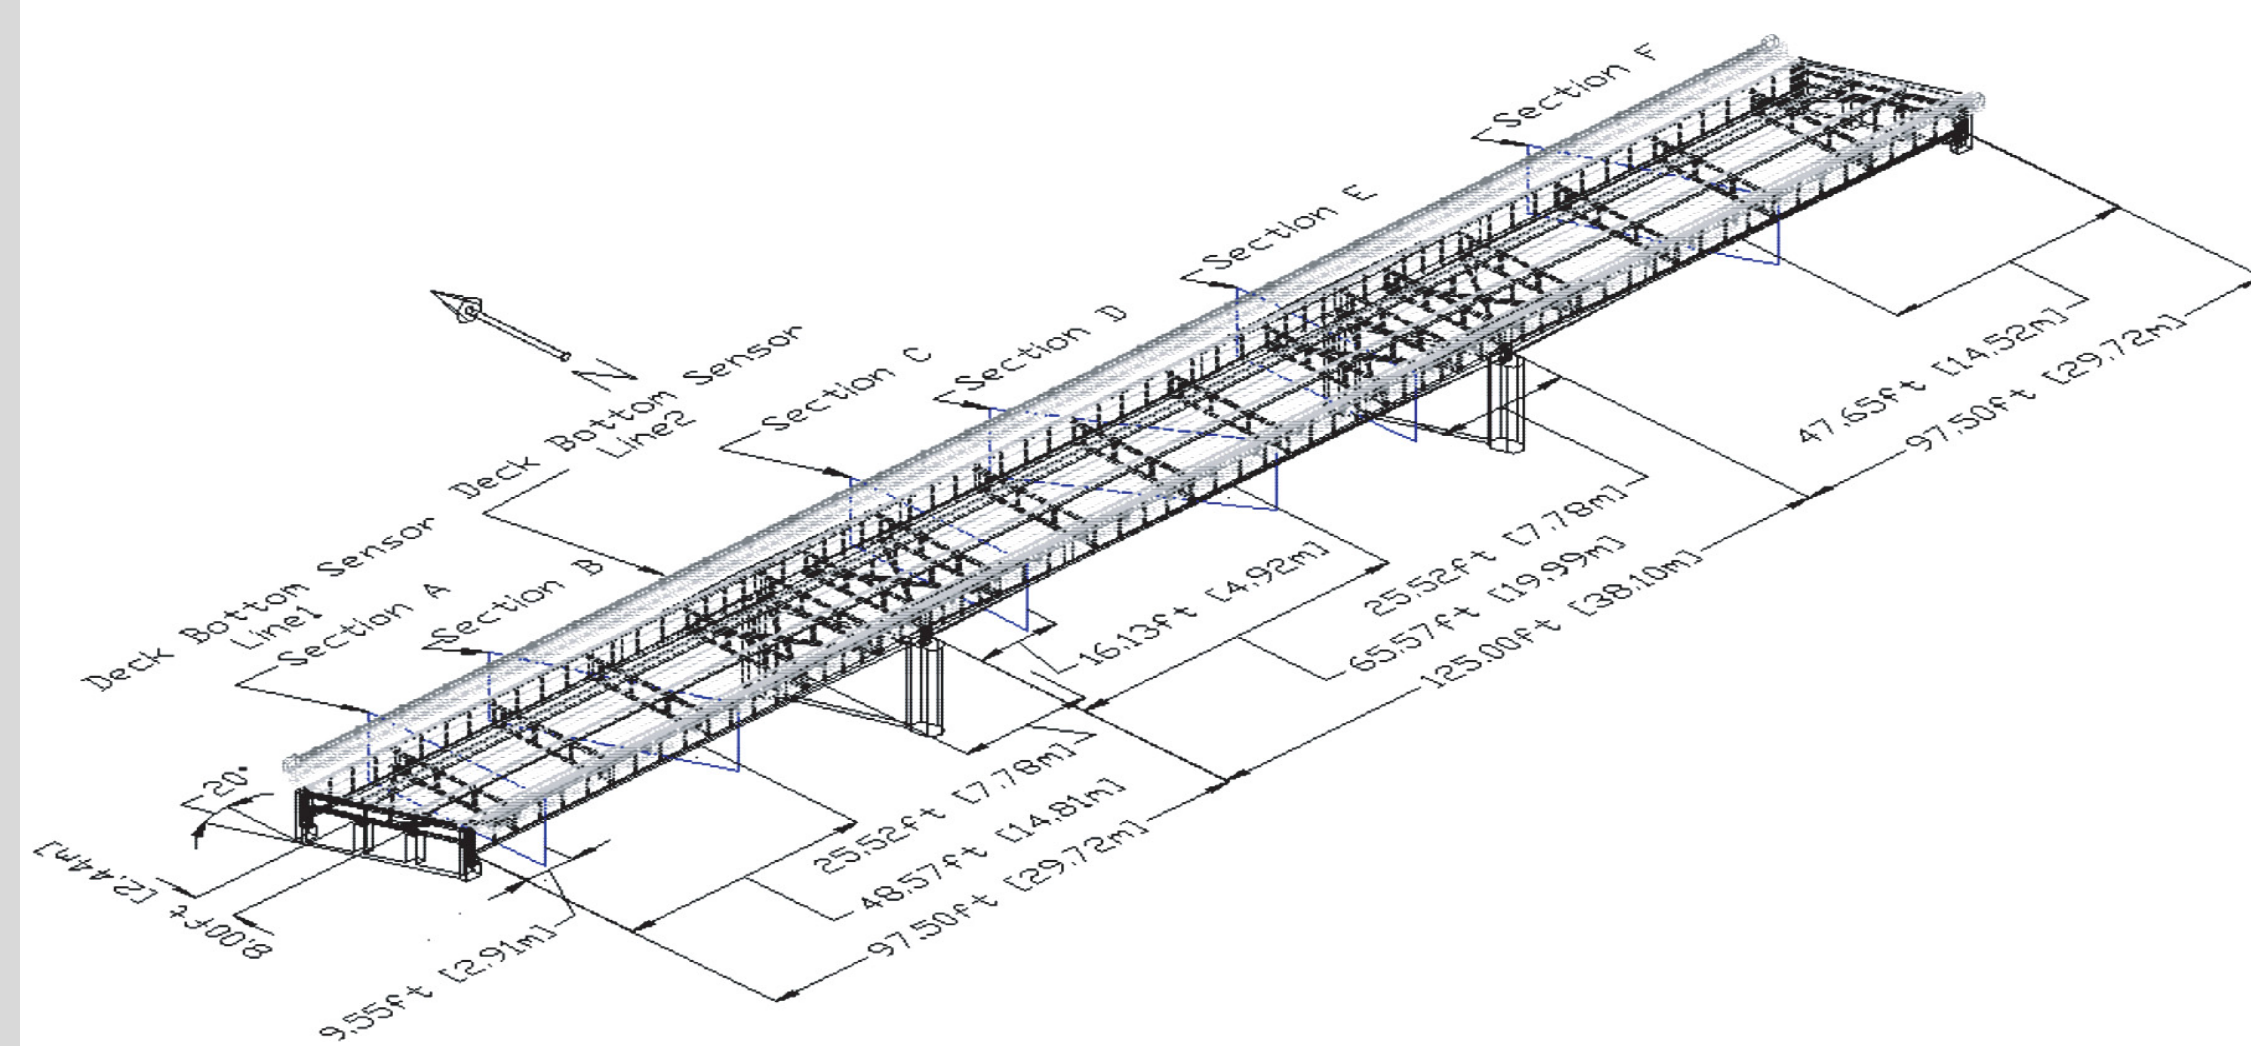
Cross Section of US30 Bridge (Lu2008)
